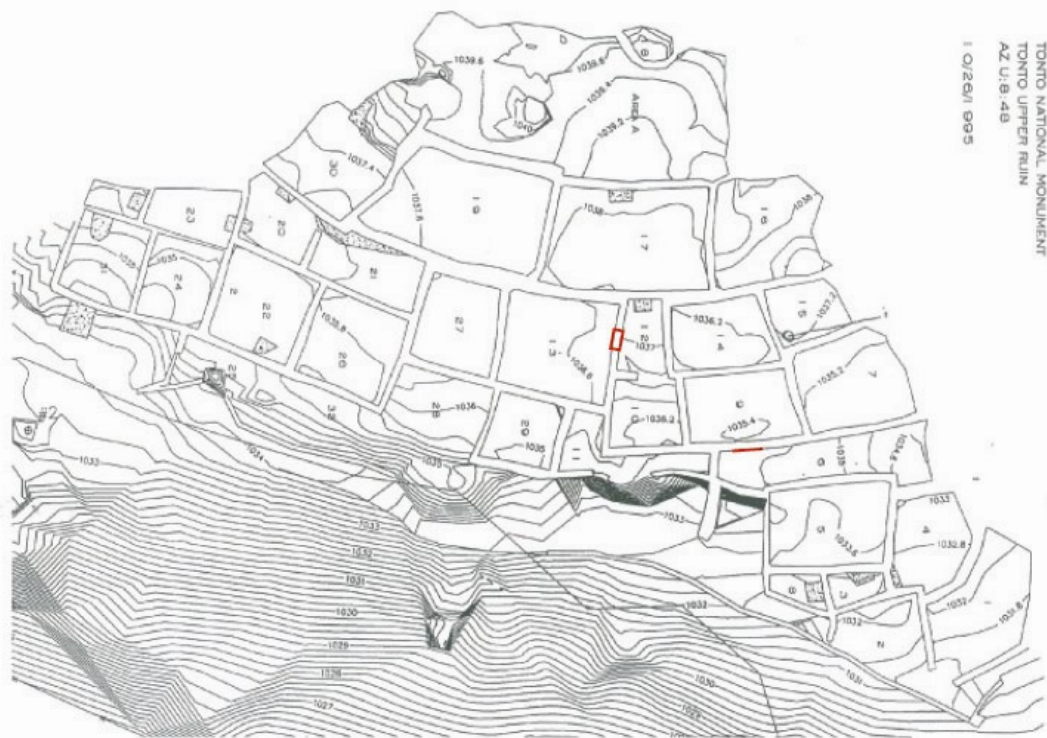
Site plan map of the Upper Cliff Dwelling with replaced wood elements shown in red.
